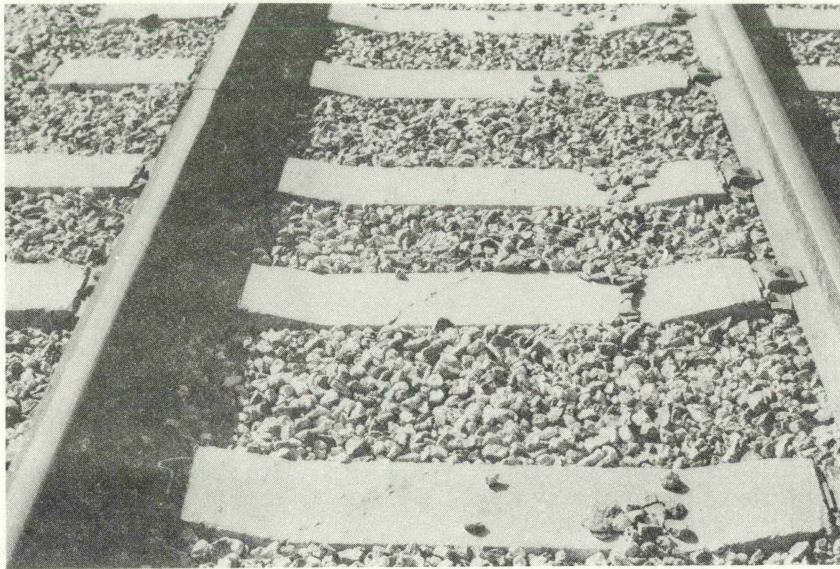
Tie Center Cracks - two ties in foreground show torsional cracks, third tie shows bending cracks (2)
